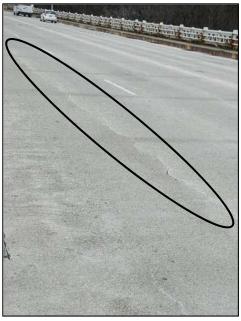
Typical 1/16" longitudinal crack, approximately 8.5' from the curb face. Arch B, south EB lane shown.
